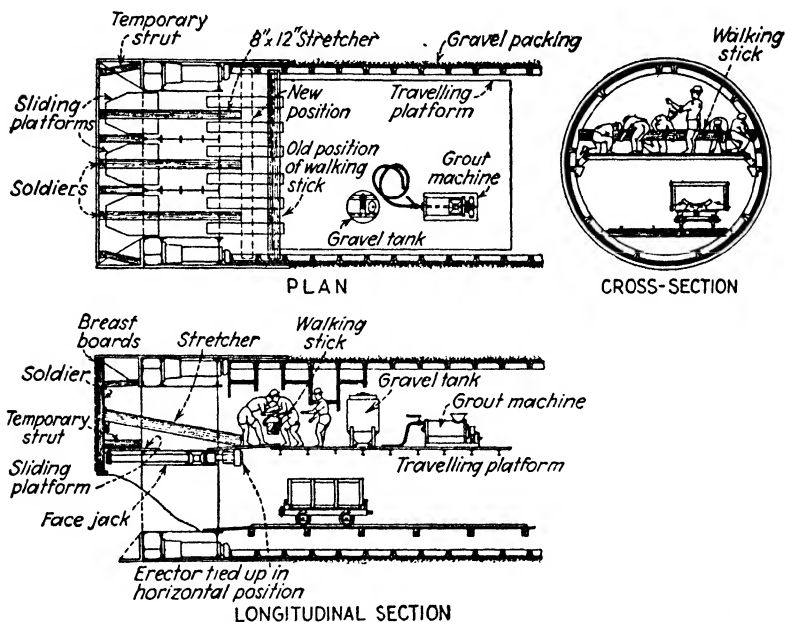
Operation of the shield in sand or gravel. The breasted face is held by both face jacks and stretchers. (Courtesy of Mason & Hanger Co.)
